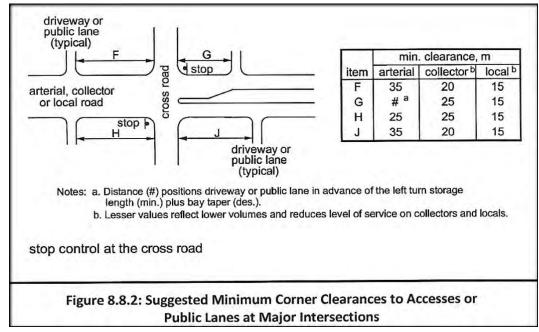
New Parking Lot Driveway Distance from 4th Line/County Road 8 Intersection
